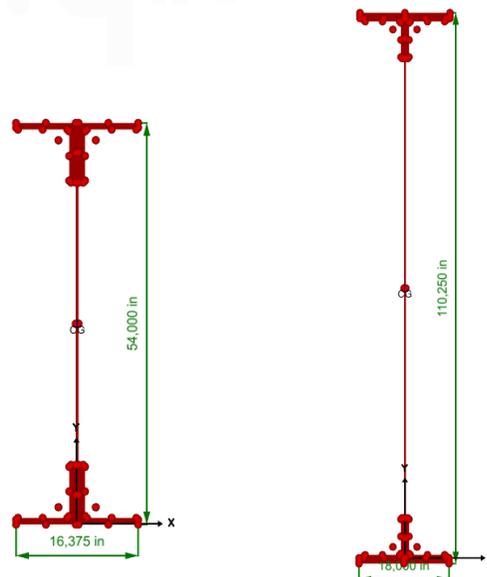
Cross sections of the 45' (left) and 90' long (right) plate girders
